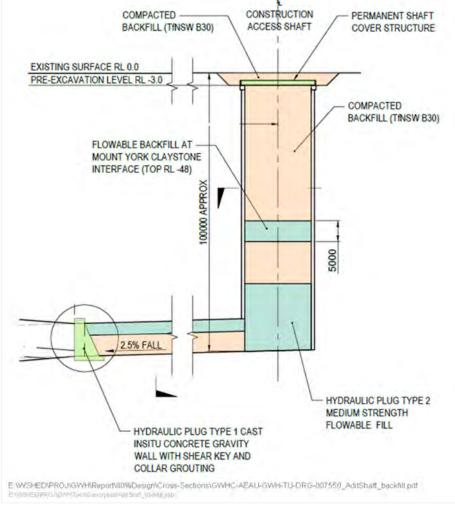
Indicative method to backfill of mid-tunnel shaft and adit
